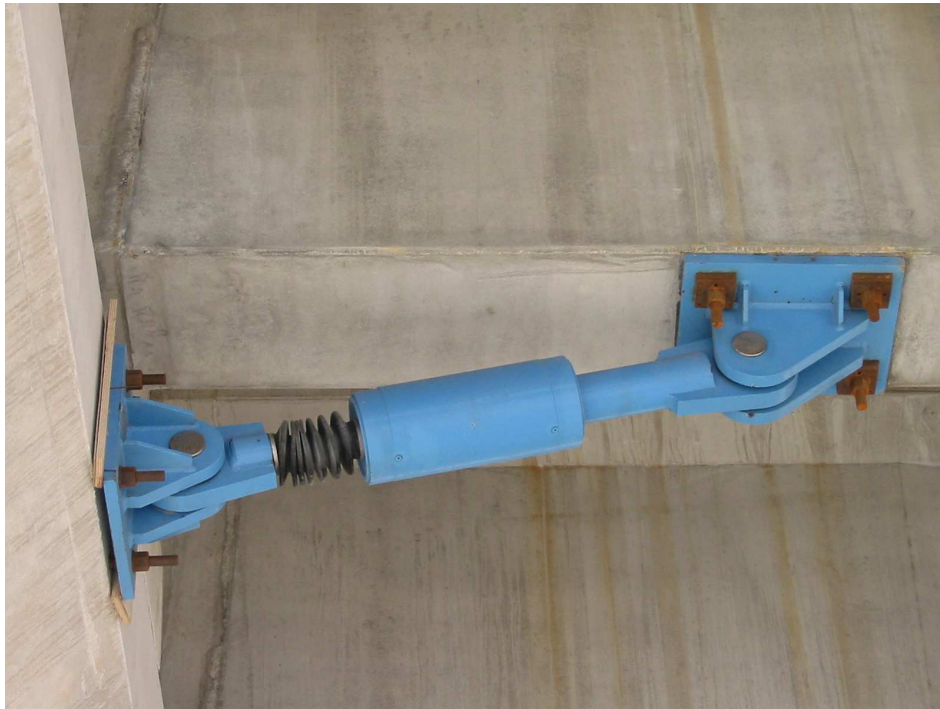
Typical damper anchoring configuration (photo taken during the installation)
